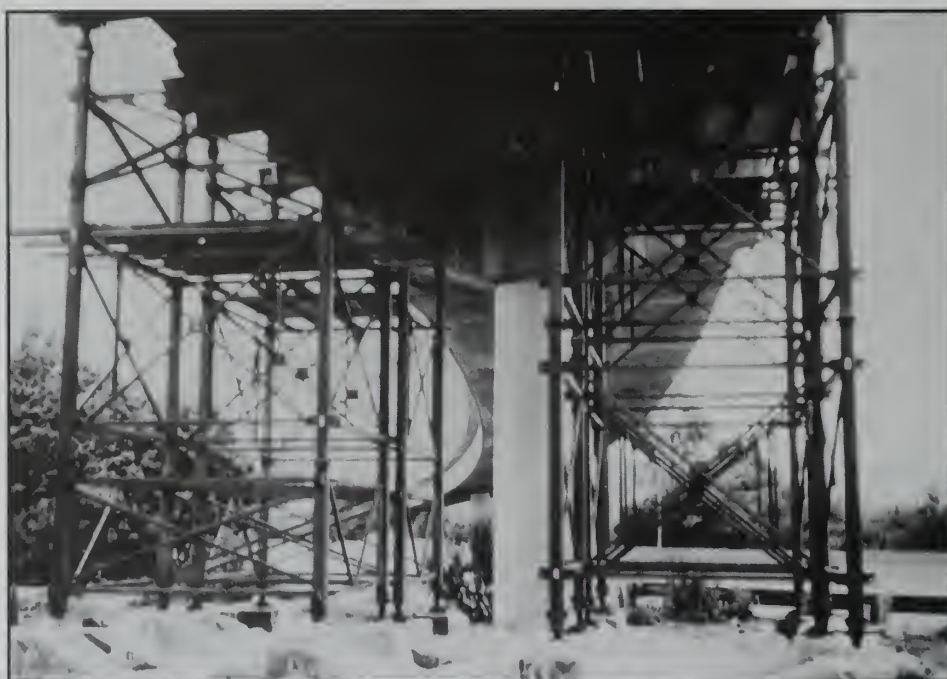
Damage to the Southeast Connector Overcrossing Bridge (53-1637F).
